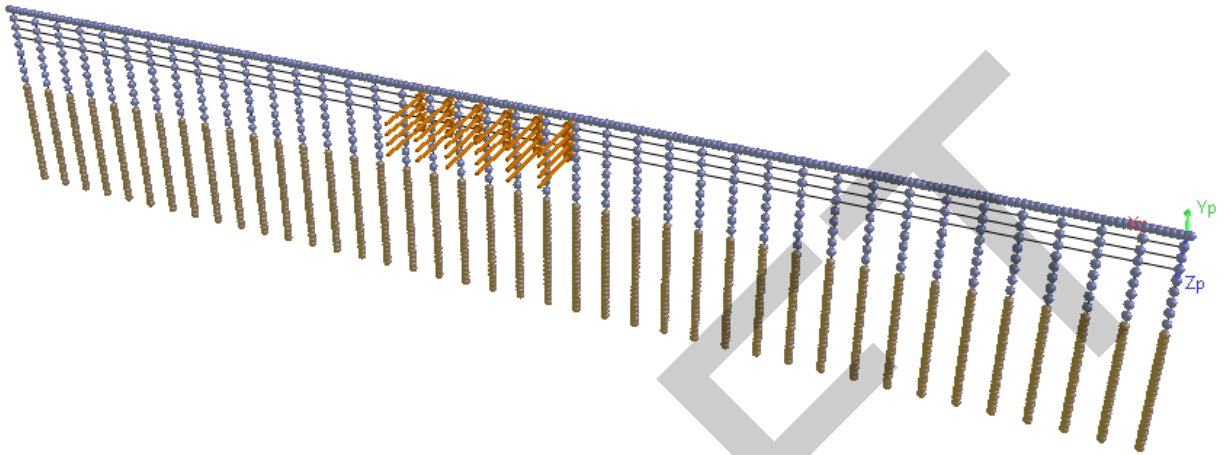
Layout – Load Case 4 (Section 3 – Soil C4)
